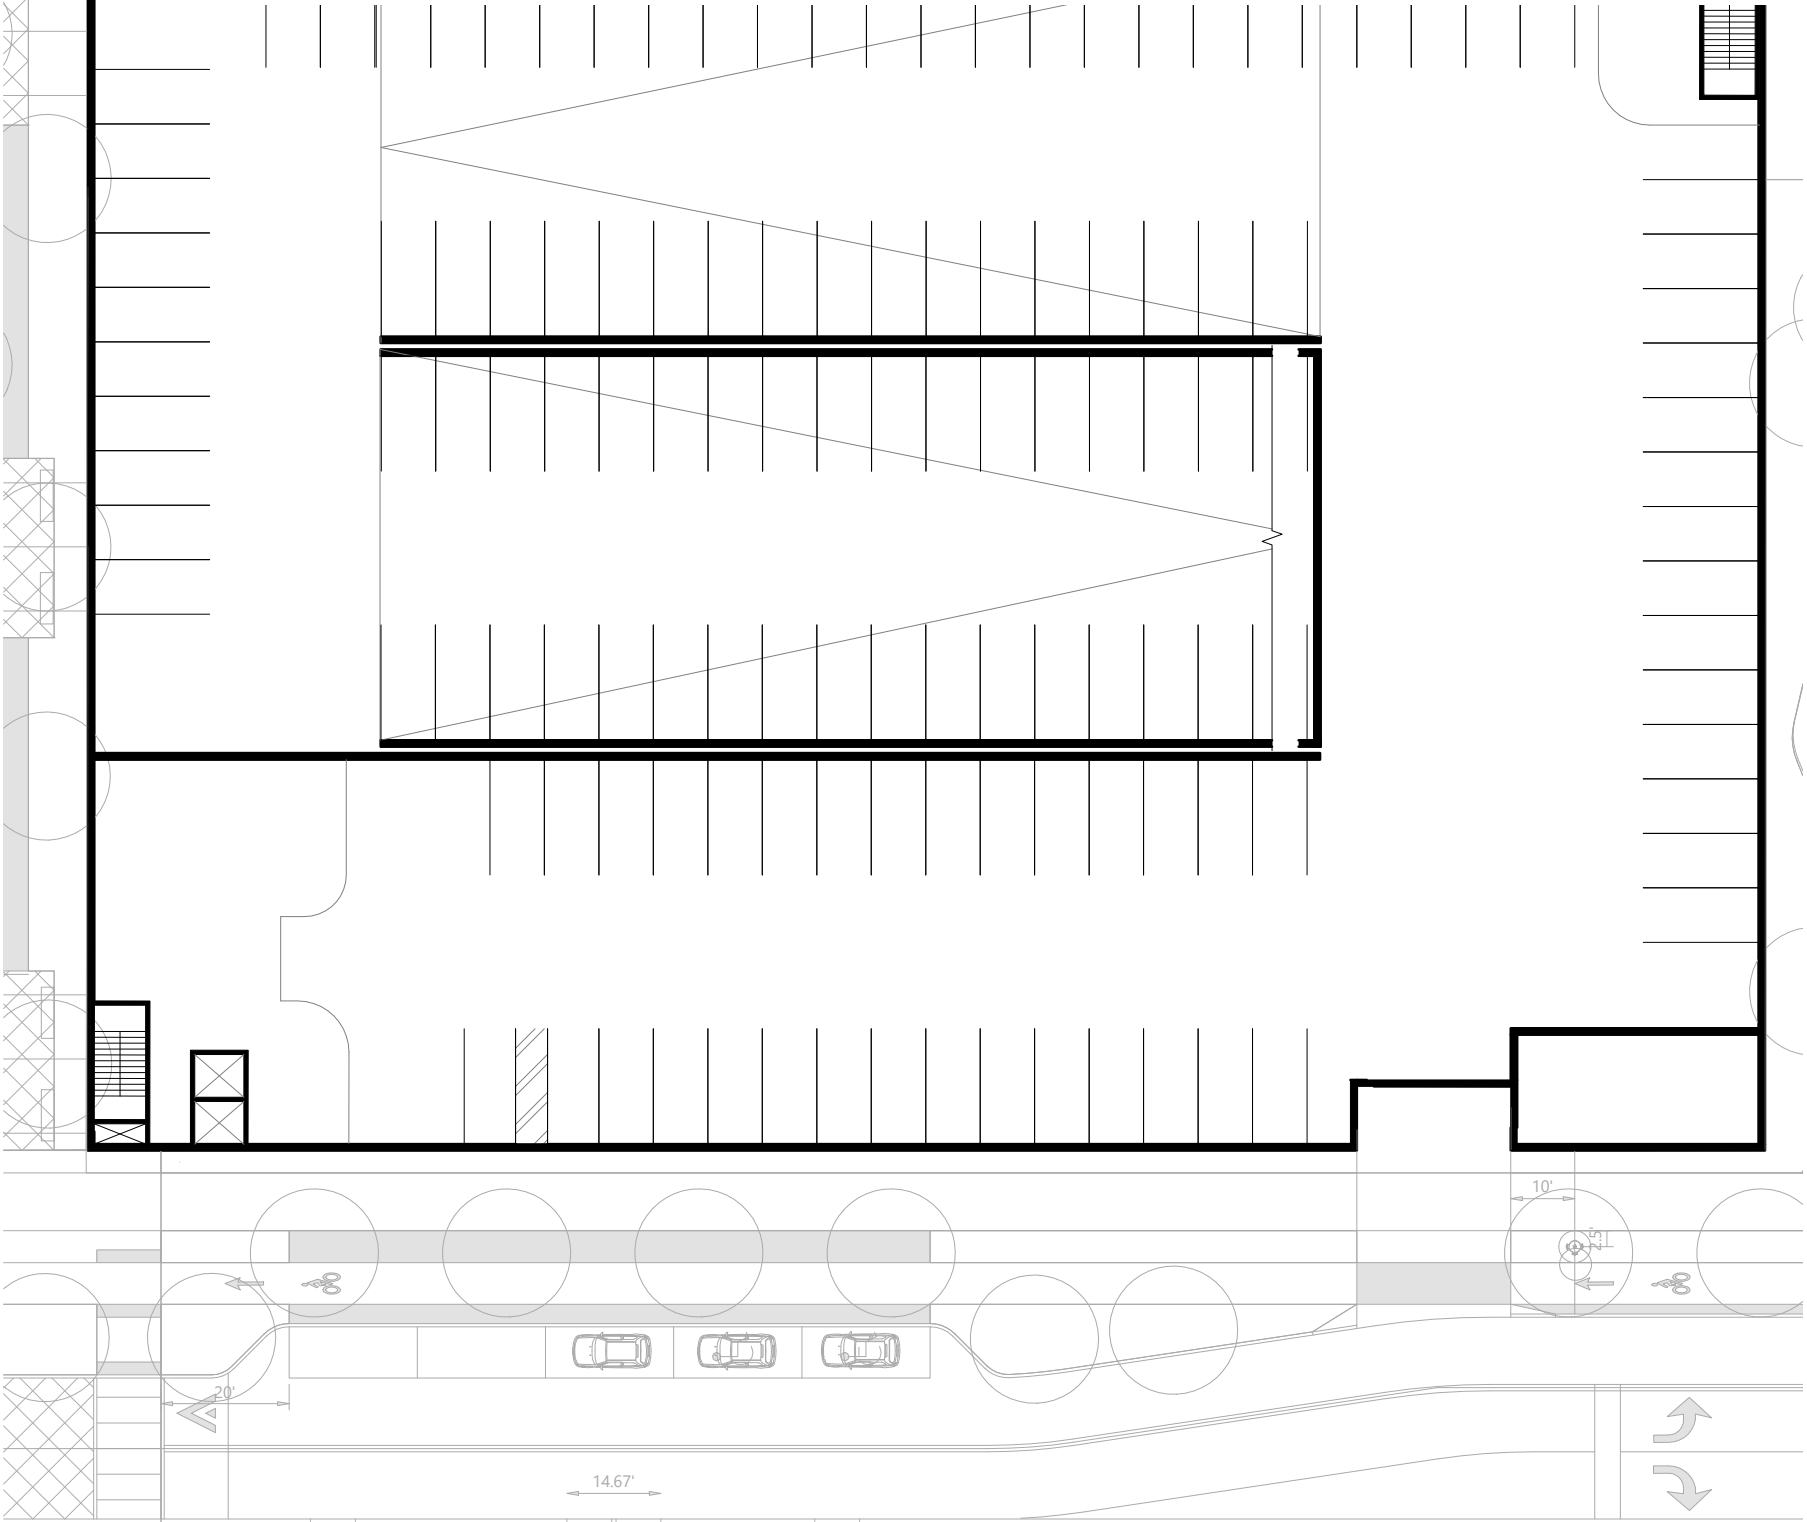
Proposed Vehicle Parking Plans - P3 Level 4
